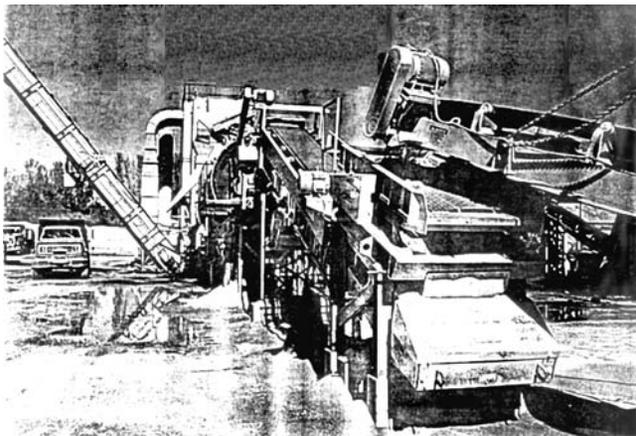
Single-deck scalping screen on drum-mix plant.
